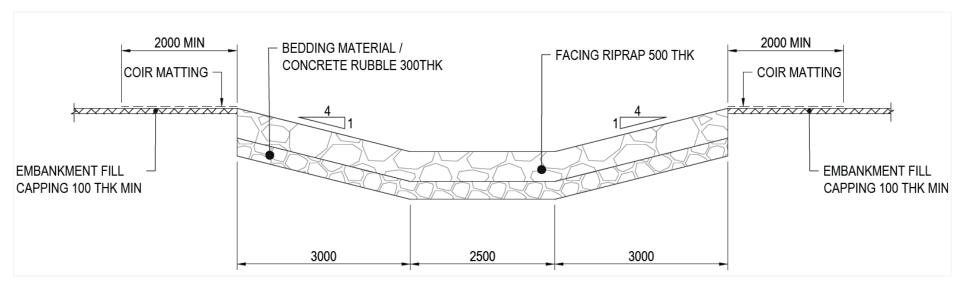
Typical cross-section of the channel and bank augmentation of Cambewarra Creek (detailed design drawing 12628715-C012)
